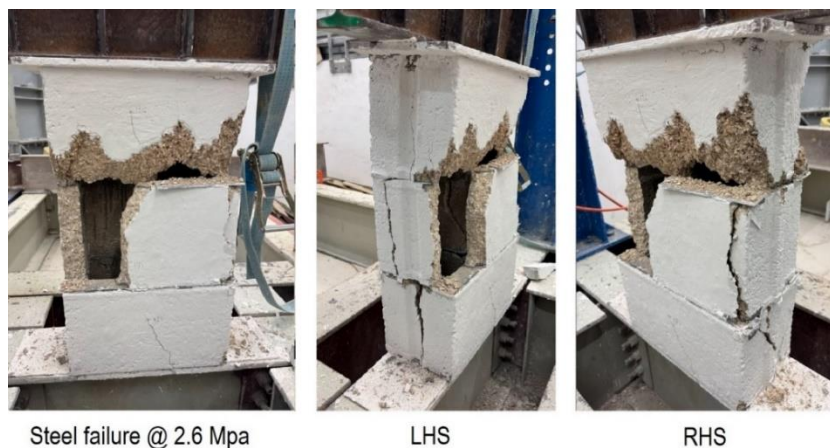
Images of Steel Shell Bedded Wallette Failure
